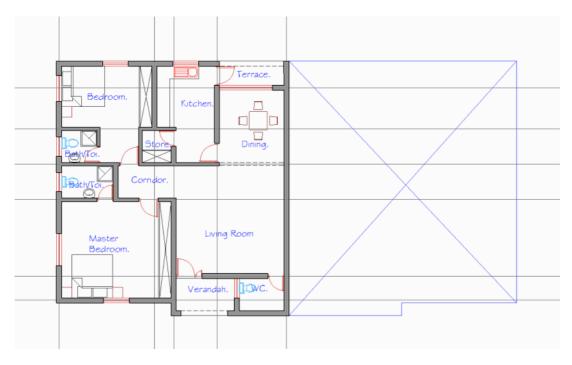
Floor plan for Case study 2 in Lugbe, Abuja
